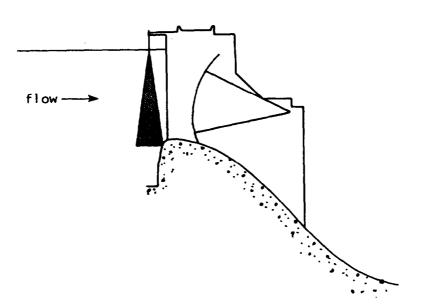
Cross section of the spillway showing transducer location and orientation. The Dallas Dam, 1985.
